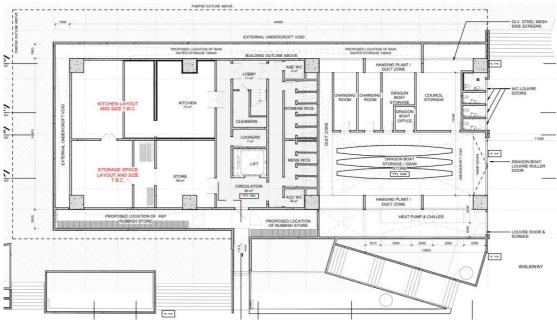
Floor plan (Basement Level) - Application Drawing RC-100
